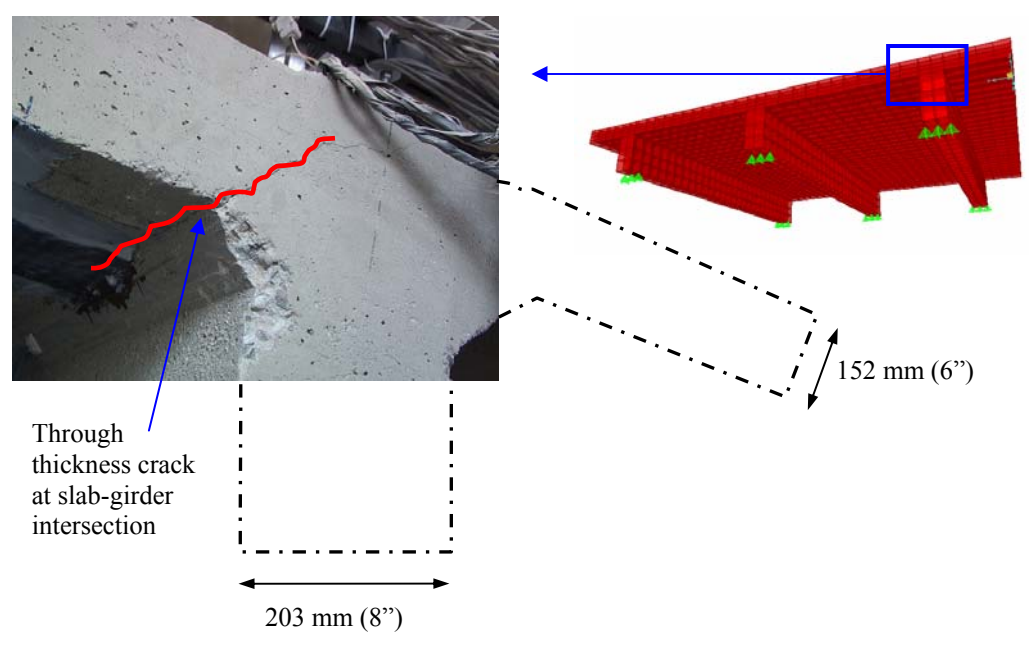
Visual inspection of cracks at 846 kN (190 kips) at slab-edge girder joint
